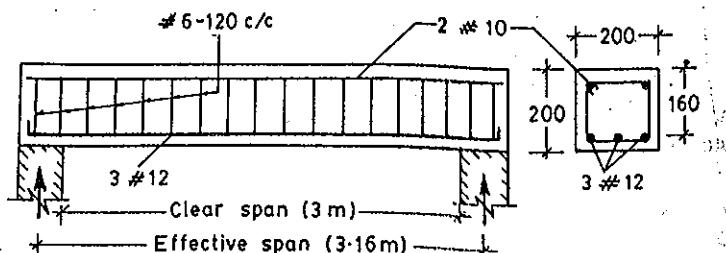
Reinforcement Details in Singly Reinforced Rectangular Beam
